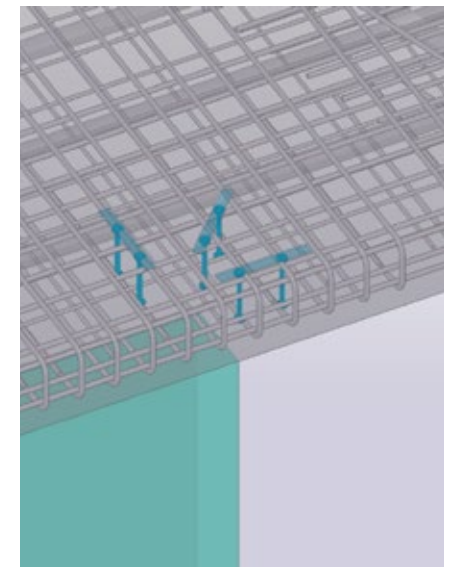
PUNCHING SHEAR DESIGN OF A SLAB WITH PSB® PUNCHING REINFORCEMENT AT BLADE COLUMN ENDS, ©RAMBOLL
